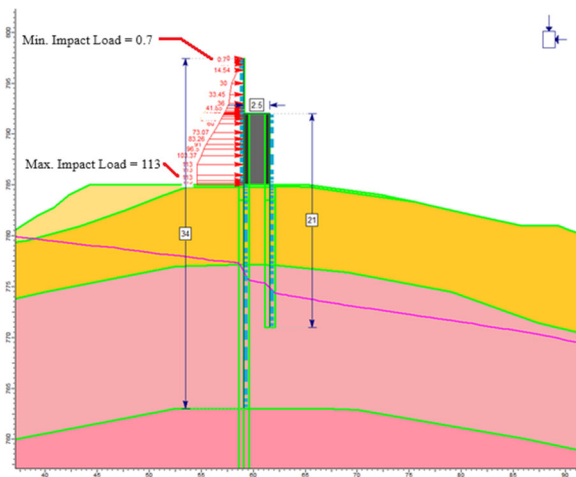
Cross-Section E-E in meters (BUD geometry and impact loadings (kPa) acting on it)
